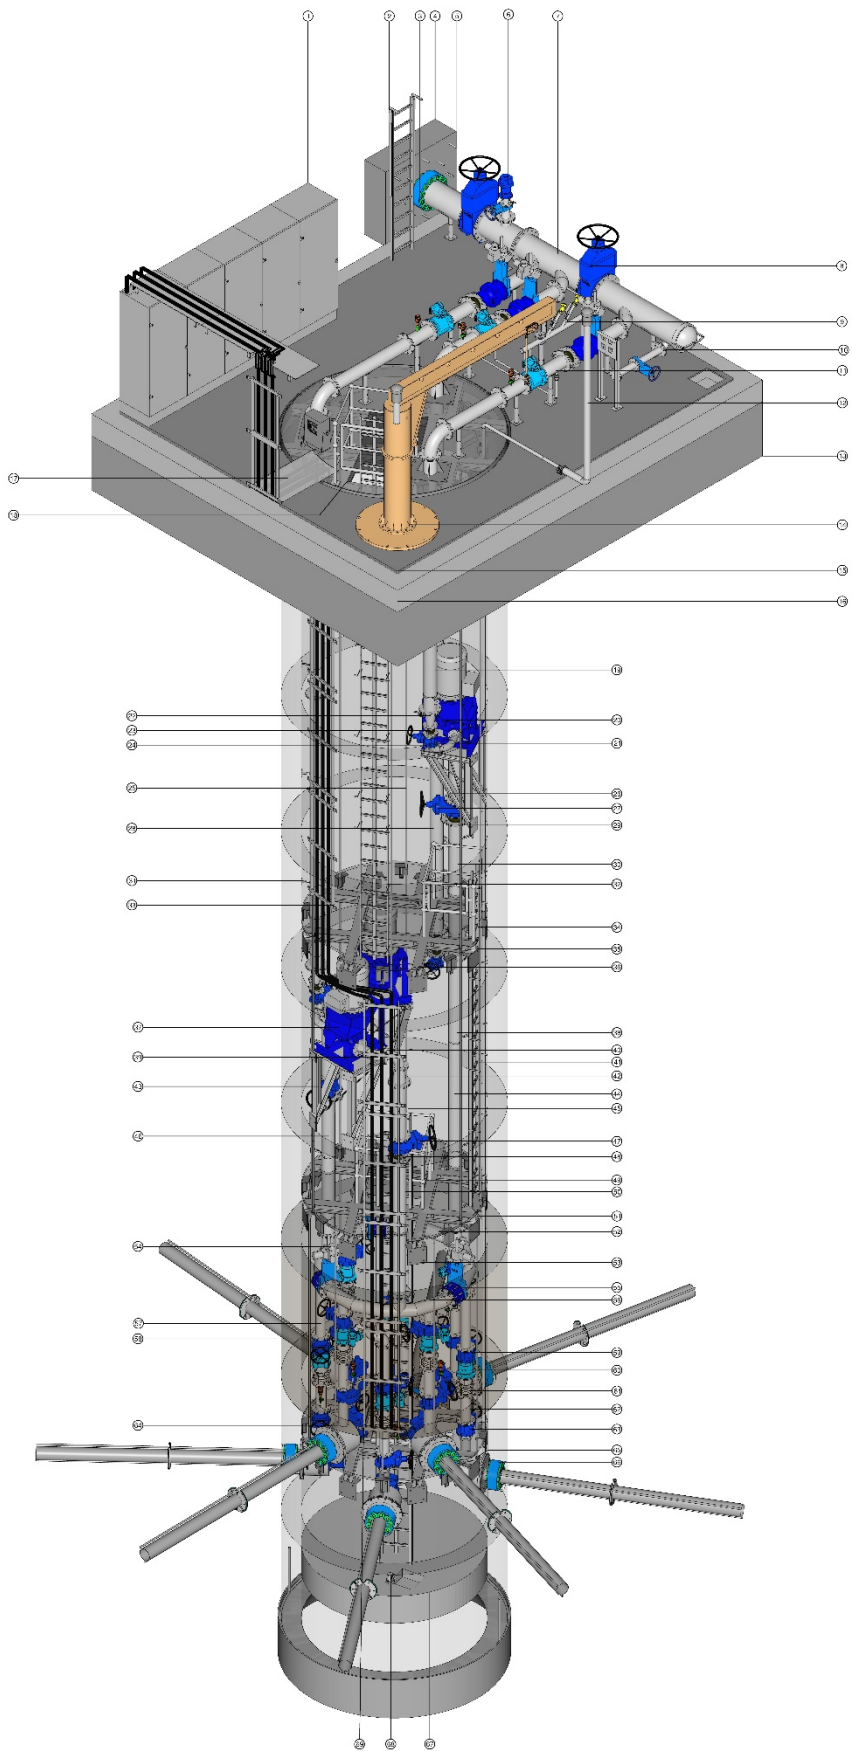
Detailed technical drawing of a radial collector well (Umweltbüro Vogtland, Daffner). (1) electric cabinet, (2) ladders, (3) sealing for pipes, (4) concrete counter bearings, (5) concrete fixing anchors, (6) air release valve, (7) collector pipe, (8) gate valve, flanged, (9) stainless steel sensor housing (pH, conductivity, temperature, oxygen), (10) connection fittings for firefighting, (11) magnetic inductive water meter and pressure probe, (12) air fan with extractor line and hood, (13) concrete foundation, (14) column crane, (15) floor cover, (16) concrete floor, (17) electrical cable cover, (18) hatch, (19) riser pipe, (20) centrifugal pumps, (21) pressure connection, (23) reducer, (24) rubber expansion joint, (25) gate valve, flanged, (26) supply line for acid (rehabilitation), (27) racket for pump, (29) gate valve , flanged, (30) riser pipe, (31) electropotential connection, (32) railing, (33) electrical cable ducts, (34) piezometer pipe, (35) platform support, (36) steel beam, (37) centrifugal pumps, (38) riser pipe, (39) pump inlet, (40) electrical supply cable for pump, (41) ladder, (42) reducer, (43) pump bracket, (44, 45, 46) riser pipes, (47) gate valve, flanged, (48) rubber expansion joint, (49) platform, (50) riser pipe, (51) platform, (52, 53) platform support, (54) Knife gate valve, (55) fitting, extension piece, (56) ring pipe (collector), (57) supply pipe from lateral to ring pipe, (58) caisson with pre-fabricated segments and laterals, (59) gate valve for lateral, (60) magnetic inductive water meter for lateral, (61) fitting and extension piece, (62) supply pipe from lateral to ring pipe, (63) gate valve for lateral, (64) gate valve housing, (65) piezometer pipe, (66) seal for caisson/lateral interface, (67) caisson floor, reinforced concrete, (68) caisson sump and pump, (69) gate valve with inspection window (plexiglas pane).
